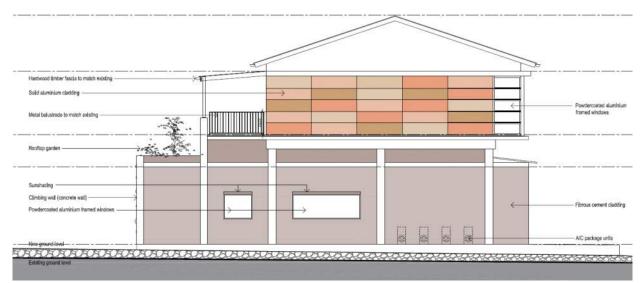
Extract of Western Elevation showing the Proposed Treatment (Source: Templum Design Architects)
